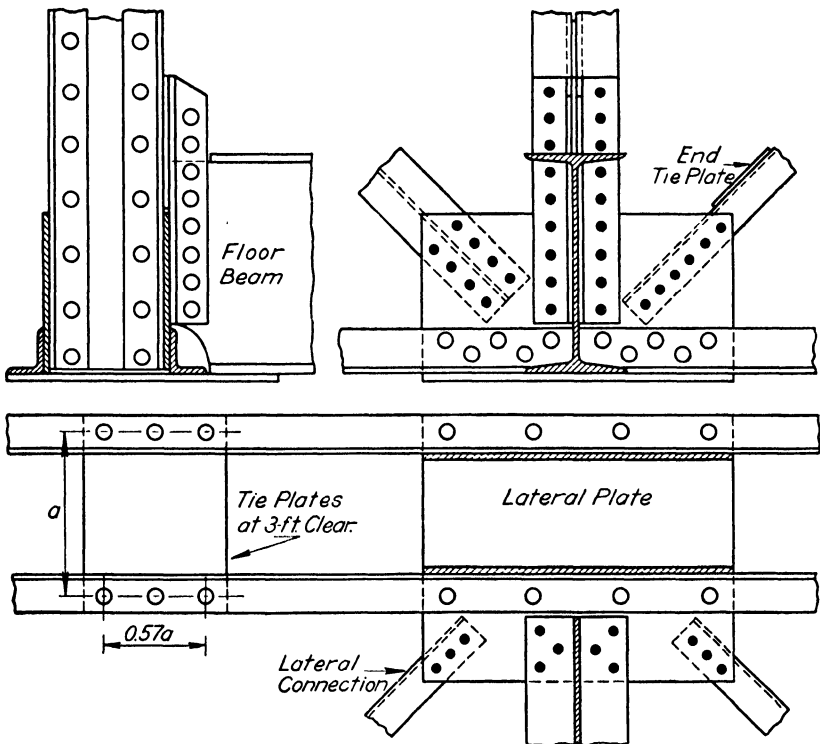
DETAIL AT A LOWER CHORD JOINT OF A HIGHWAY BRIDGE TRUSS.
